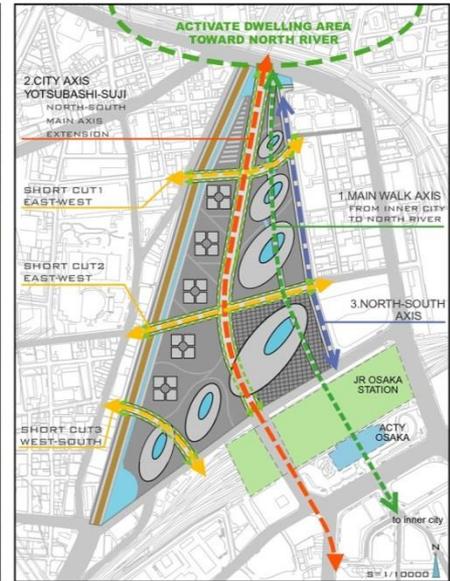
BLOCK PLAN & ROAD PLAN for FUNCTION EXPLANATION
